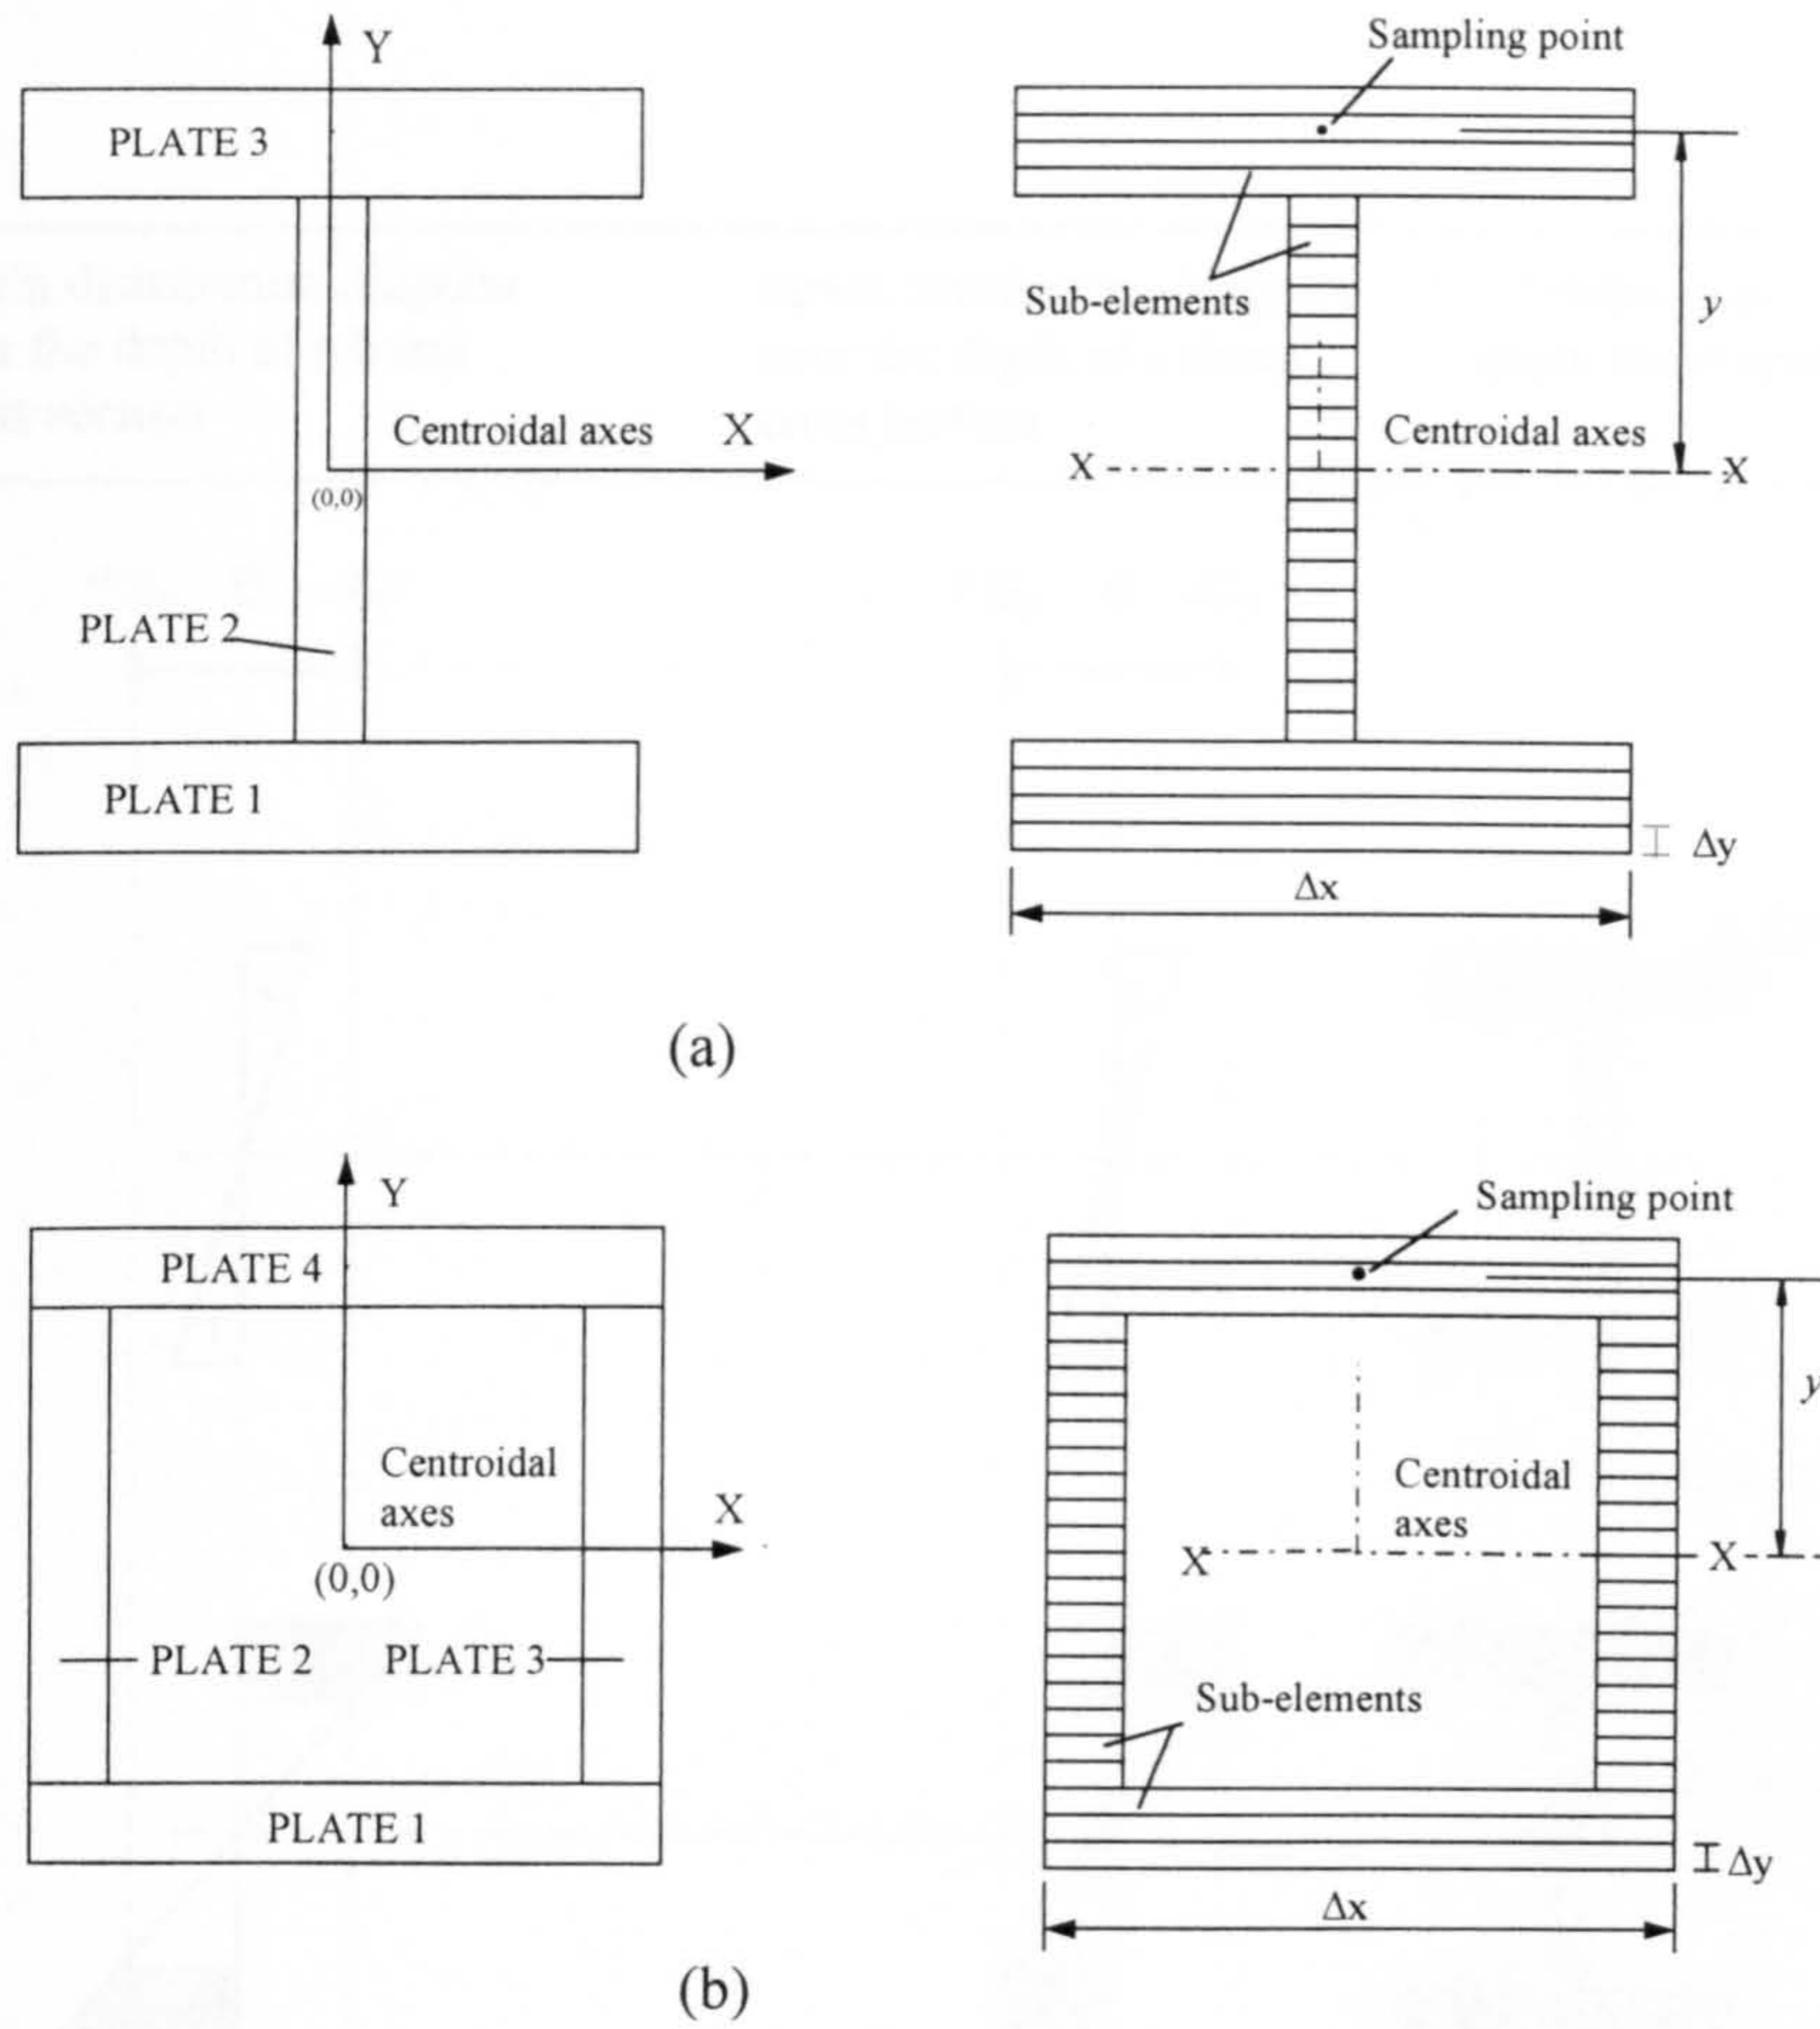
Discretised of cross section into plates and sub-elements for
